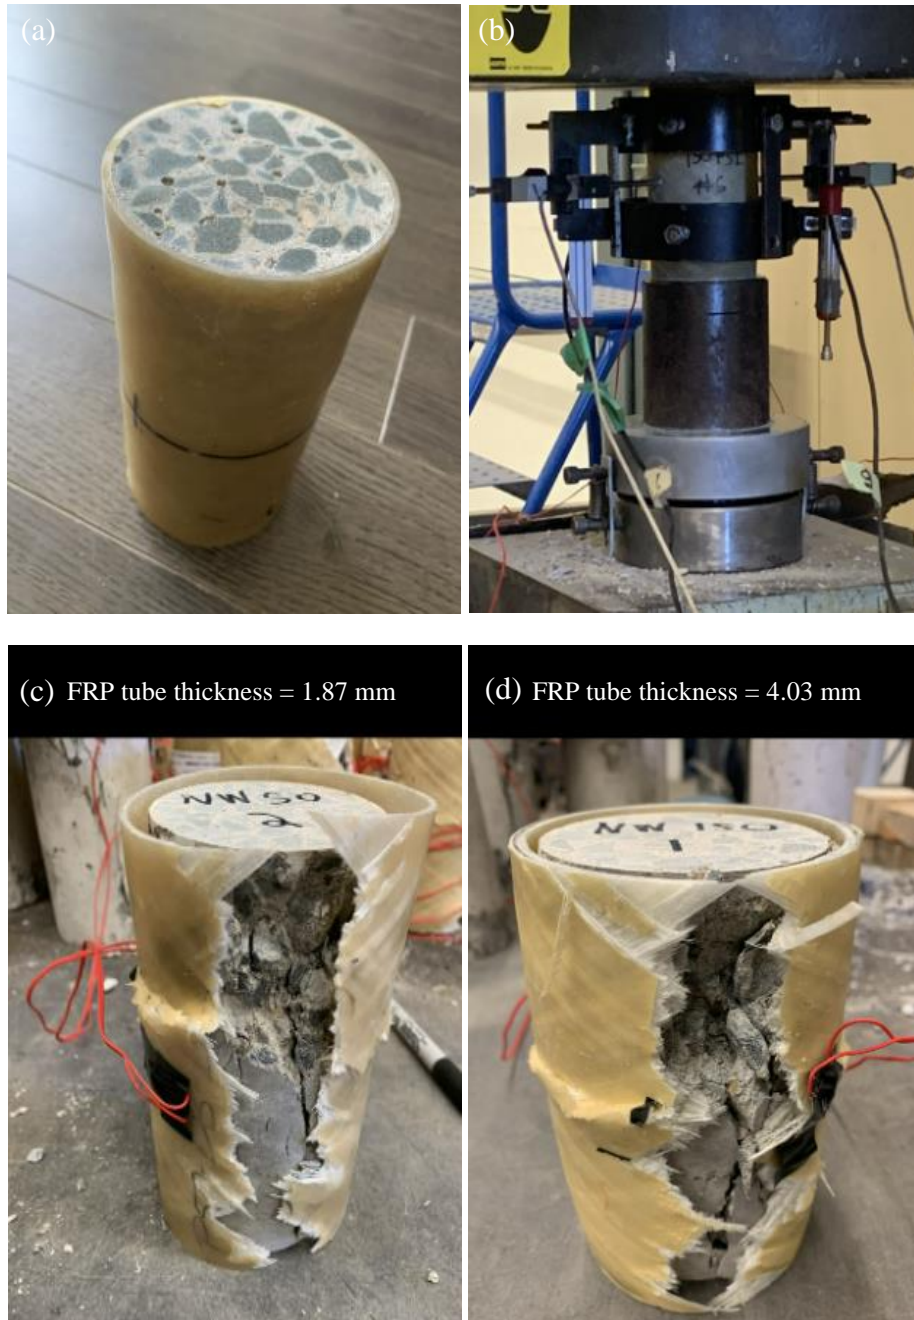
CFFT Test Specimens: a) NDCFFT-P150 test specimen end grinded at a 2:1 ratio; b) displacement-controlled testing of the CFFT specimens; c) P50-NDCFFT failure; d) NDCFFT-P150 hoop rupture failure.
